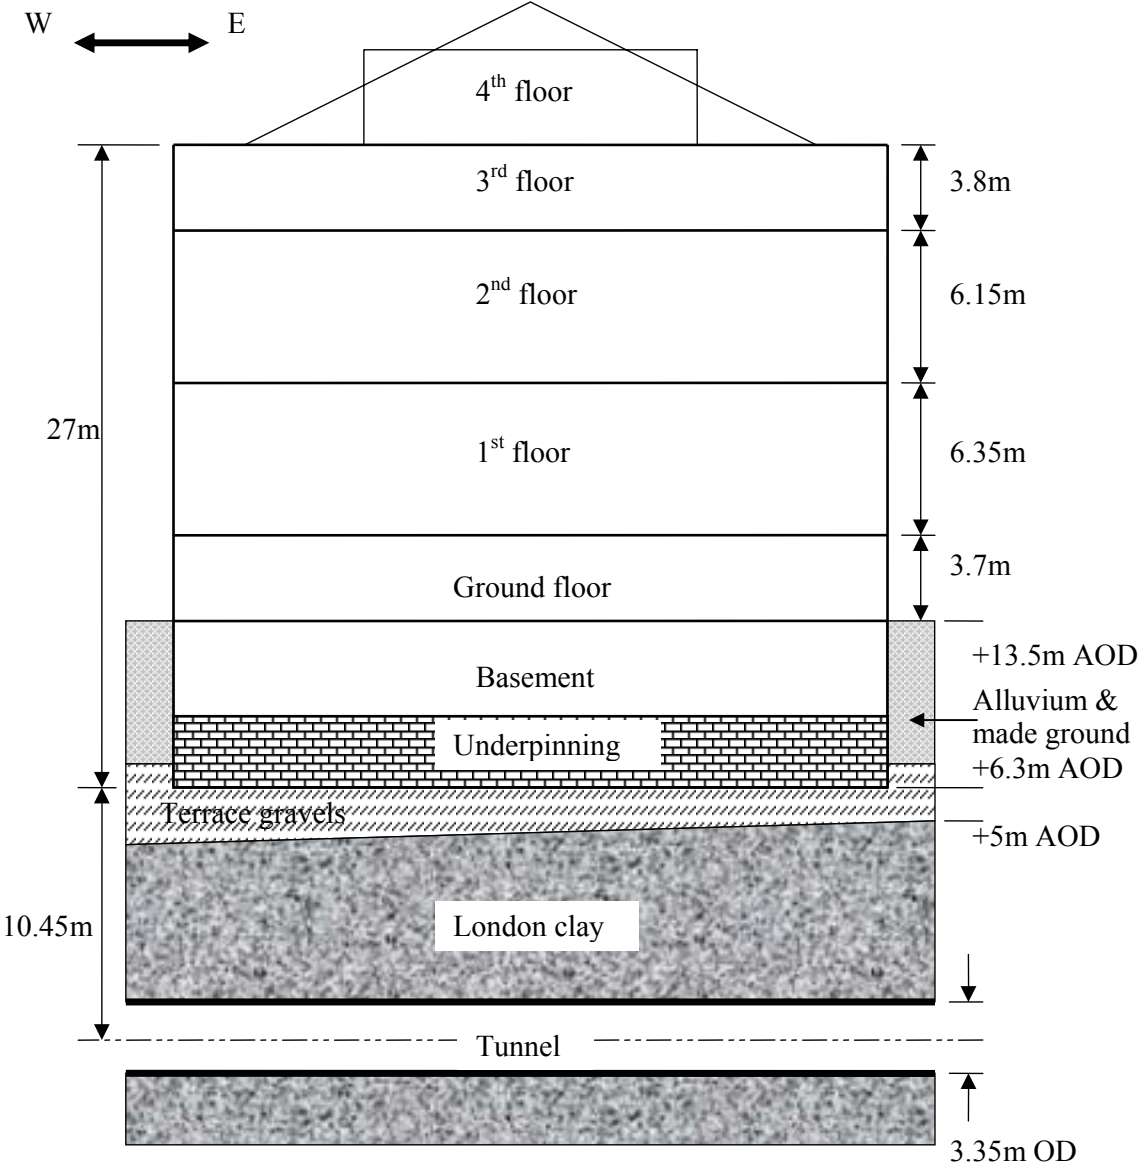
Section through Mansion House site showing building, tunnel and geological strata
